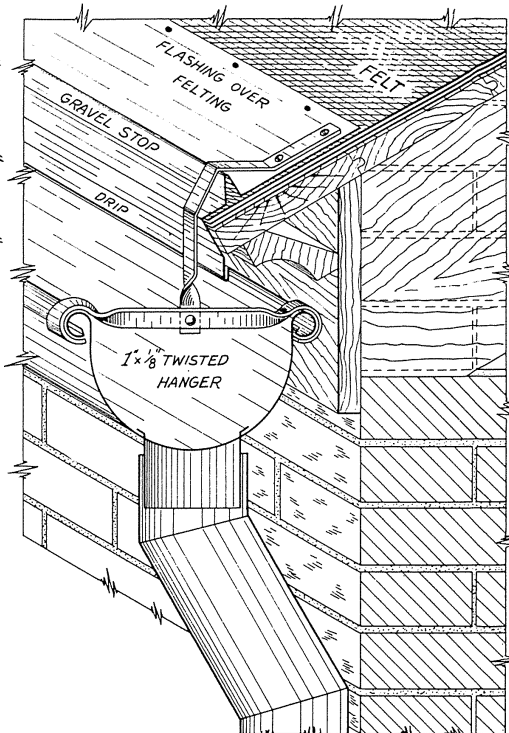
DOUBLE BEAD EAVE TROUGH WITH TWISTED HANGER FOR COMPOSITION AND FLAT TILE ROOF INSTALLATION
